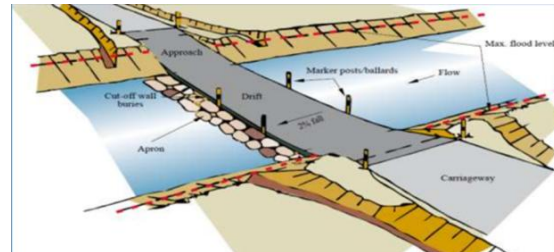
Layout of drift showing approach, running surface, cut-off wall and apron
